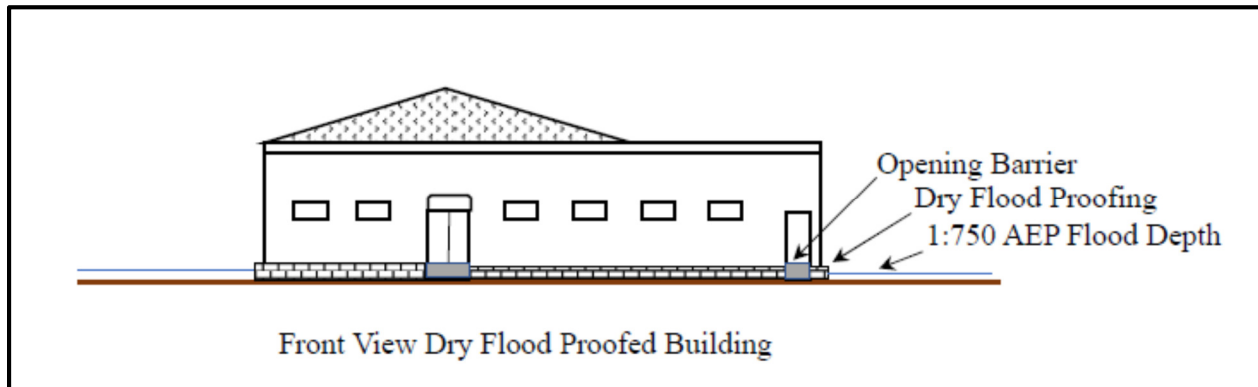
Building Retrofitted with Dry Flood Proofing
